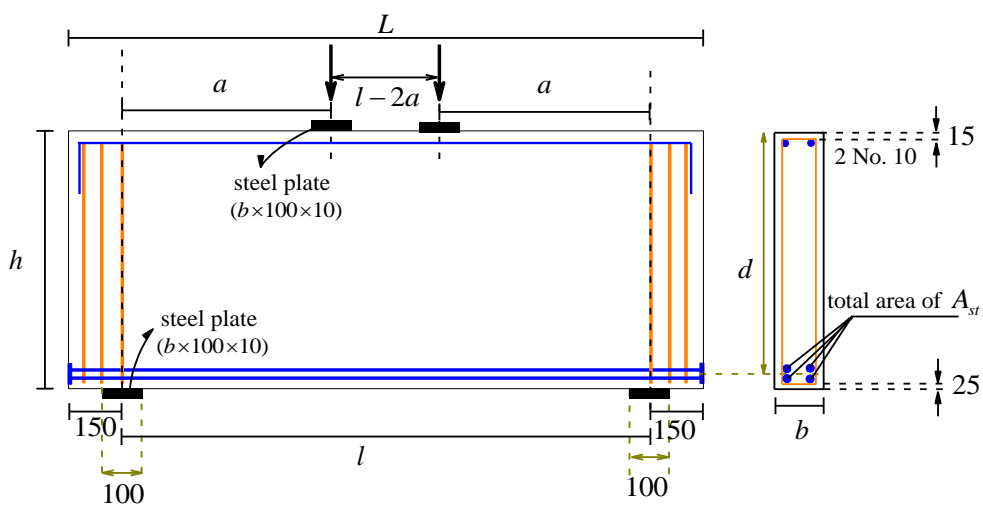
Geometry and reinforcement layout for the beams tested by Yang et al. (2003) (dimensions in mm).
